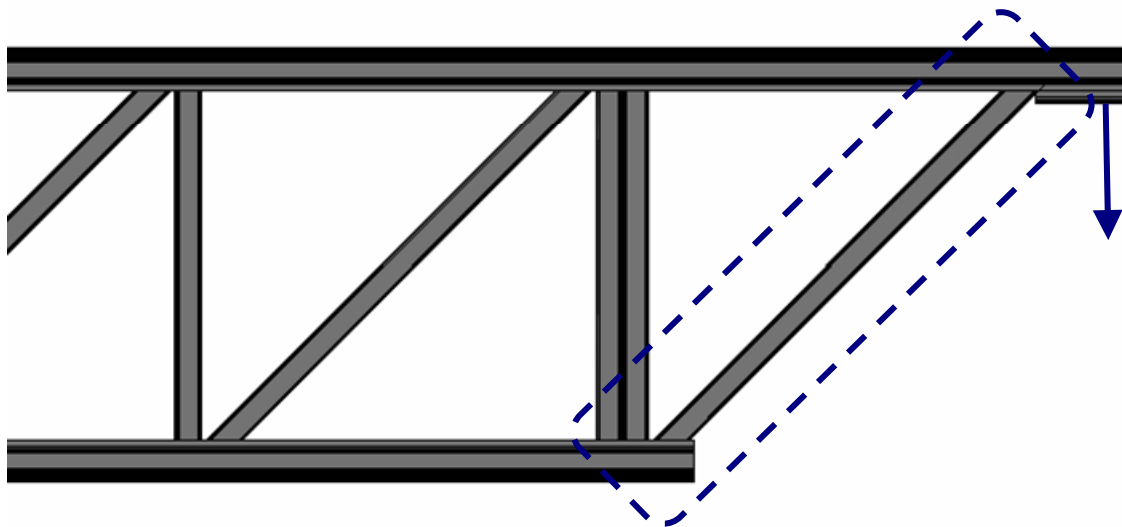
First Web Member of Cold-Formed Joist – Elevation view
